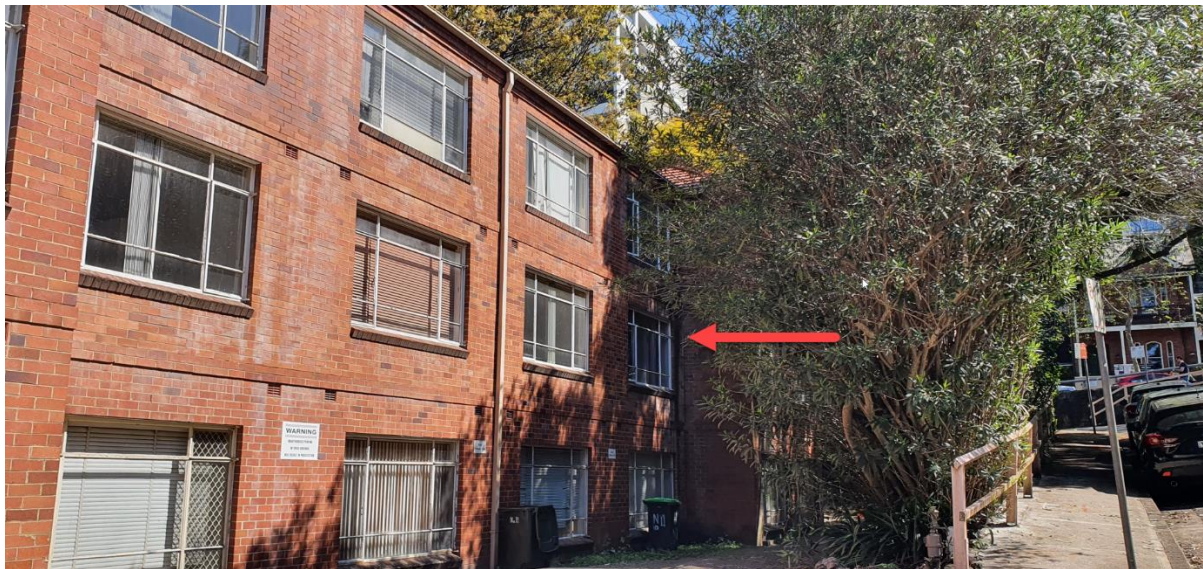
View of the site from Hampden Street showing the 3 storey flat building (red arrow) and other buildings to be demolished.
